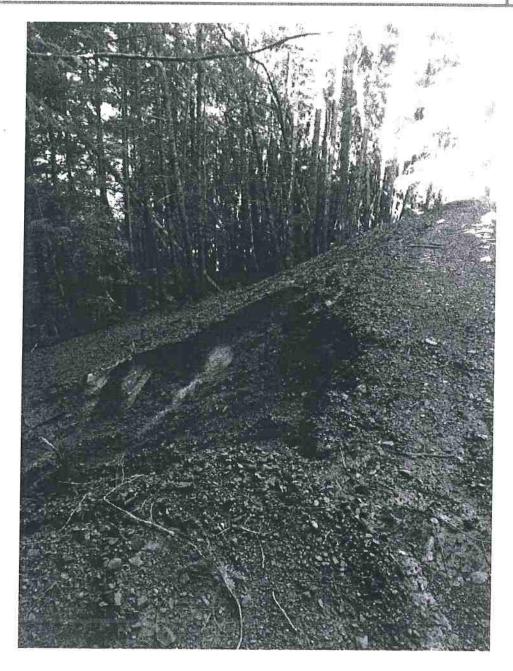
Erosion on fill slope of pond #1. Photo date 1-24-17
